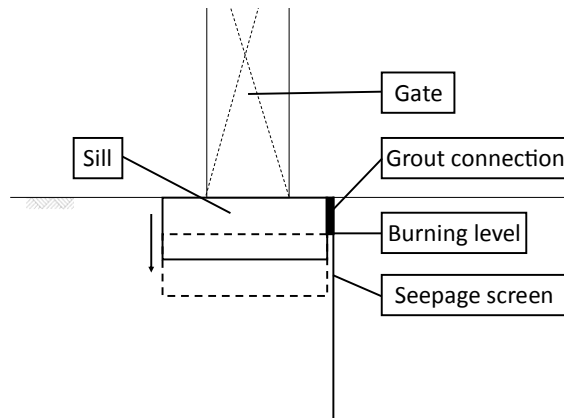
cross section of the sill with seepage screen and measures for lowering of the sill
